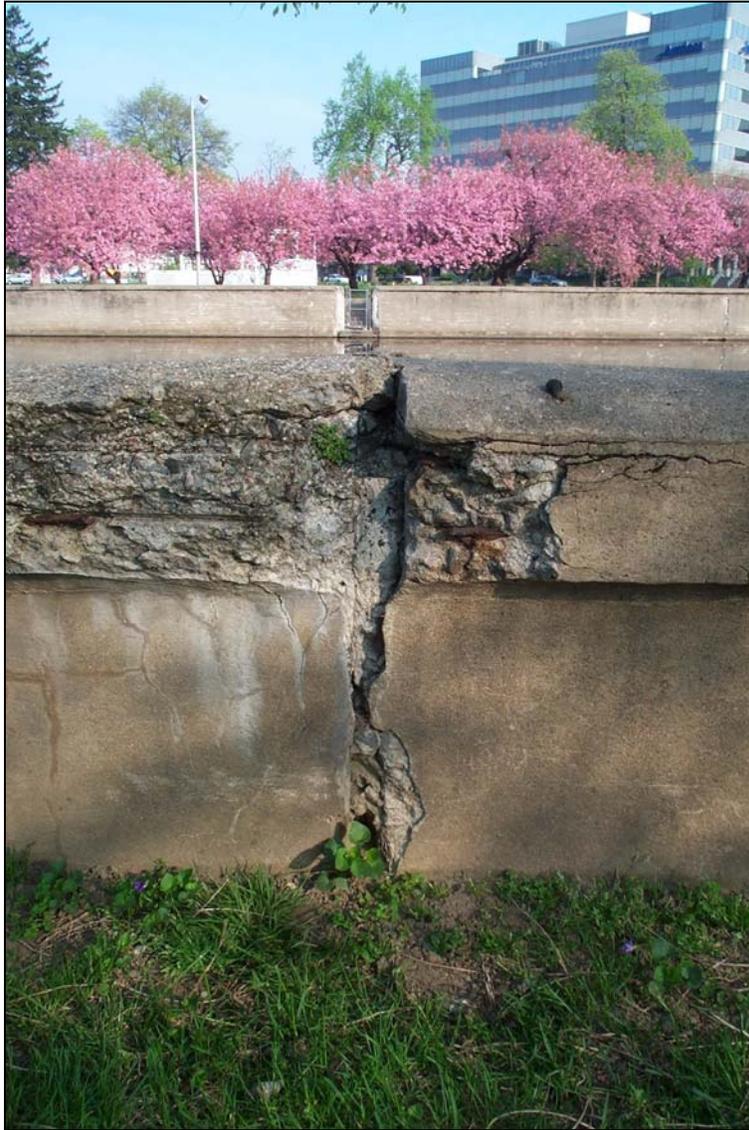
Cracked retaining wall of the Mill Pond impoundment
